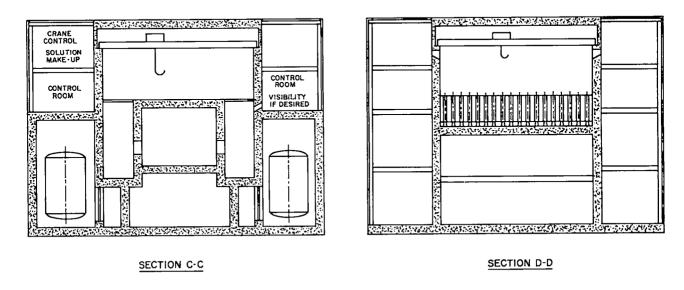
Coprecal facility layout, sections C-C, D-D.
